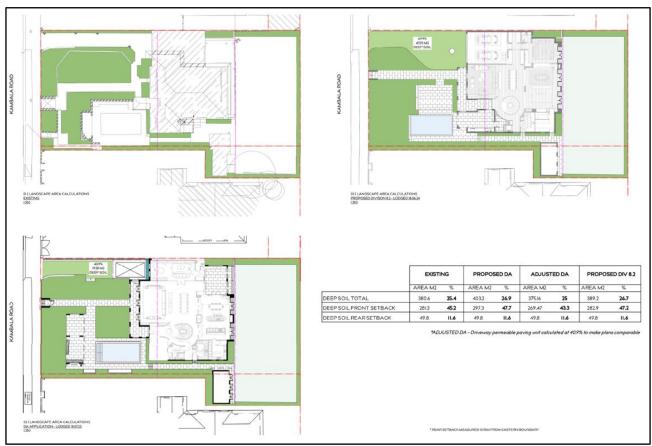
Existing, proposed & amended deep soil landscaped areas. Source: Amended Landscape Plans Rev 05
